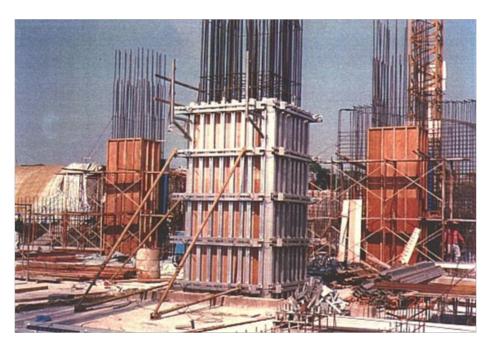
Formwork Striking (Stripping or Removal)
